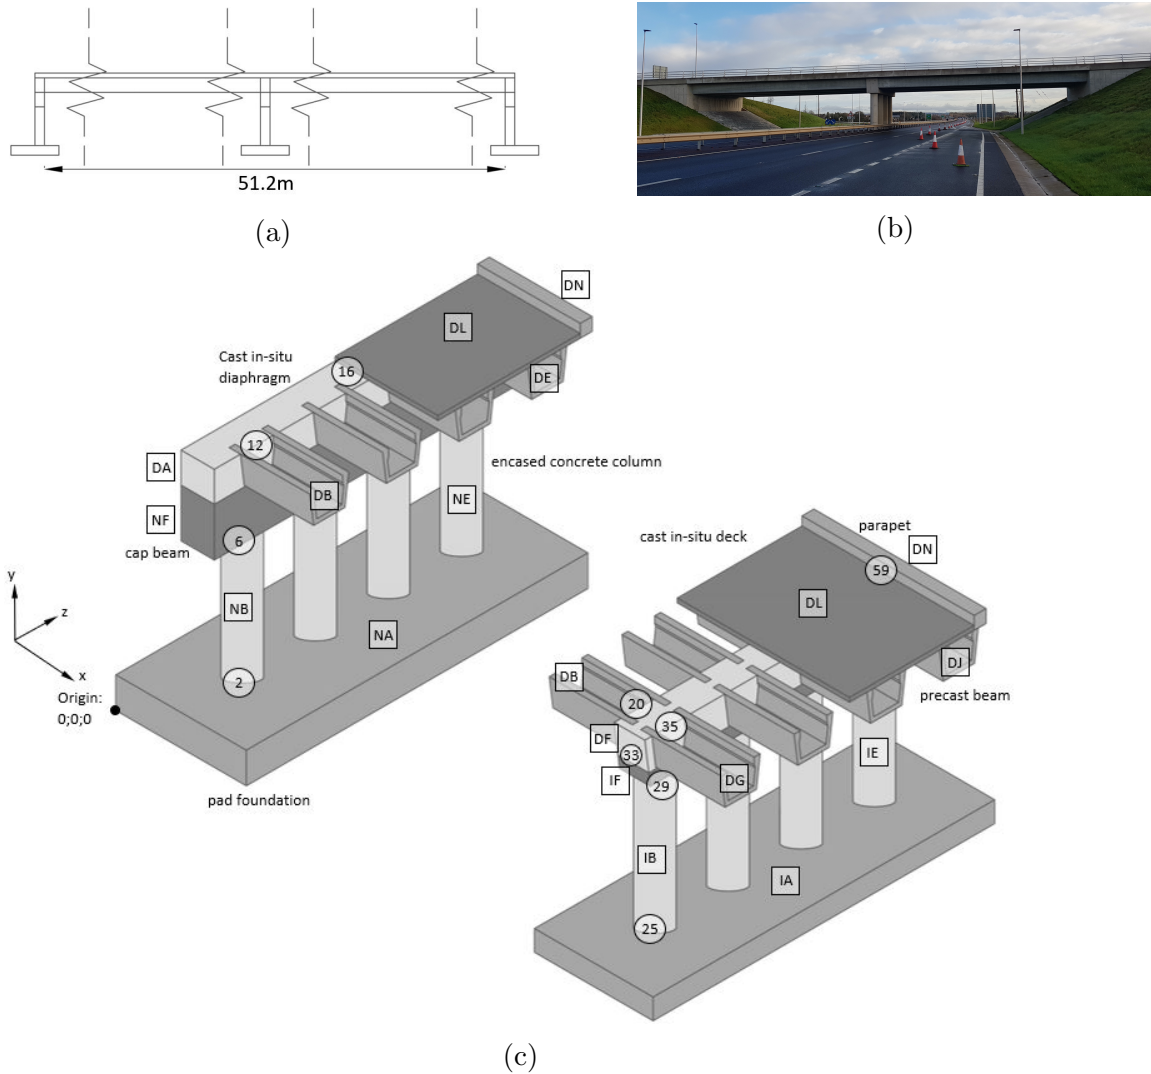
Beam-and-slab bridge: (a) schematic elevation of the bridge, (b) photo of the bridge and (c) stepped sections of the North abutment (left) and intermediate pier (right) annotated with Element and Joint IDs.
